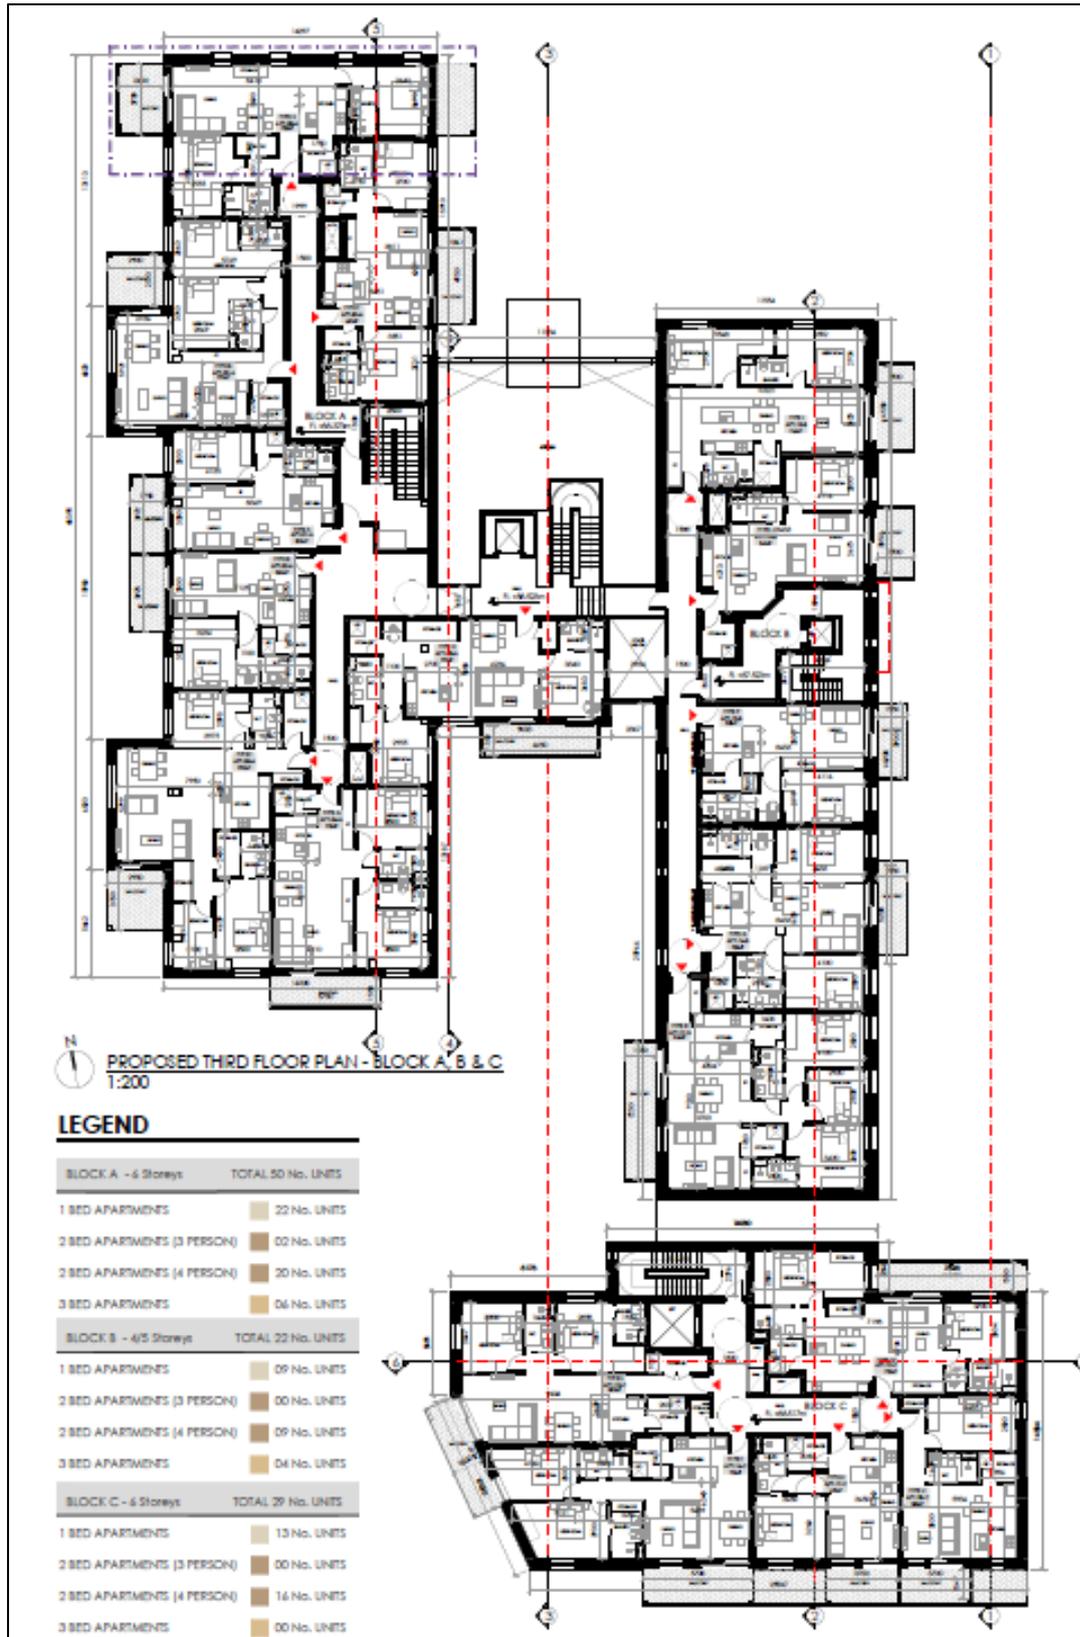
Third floor plan of the proposed Blocks A, B and C
